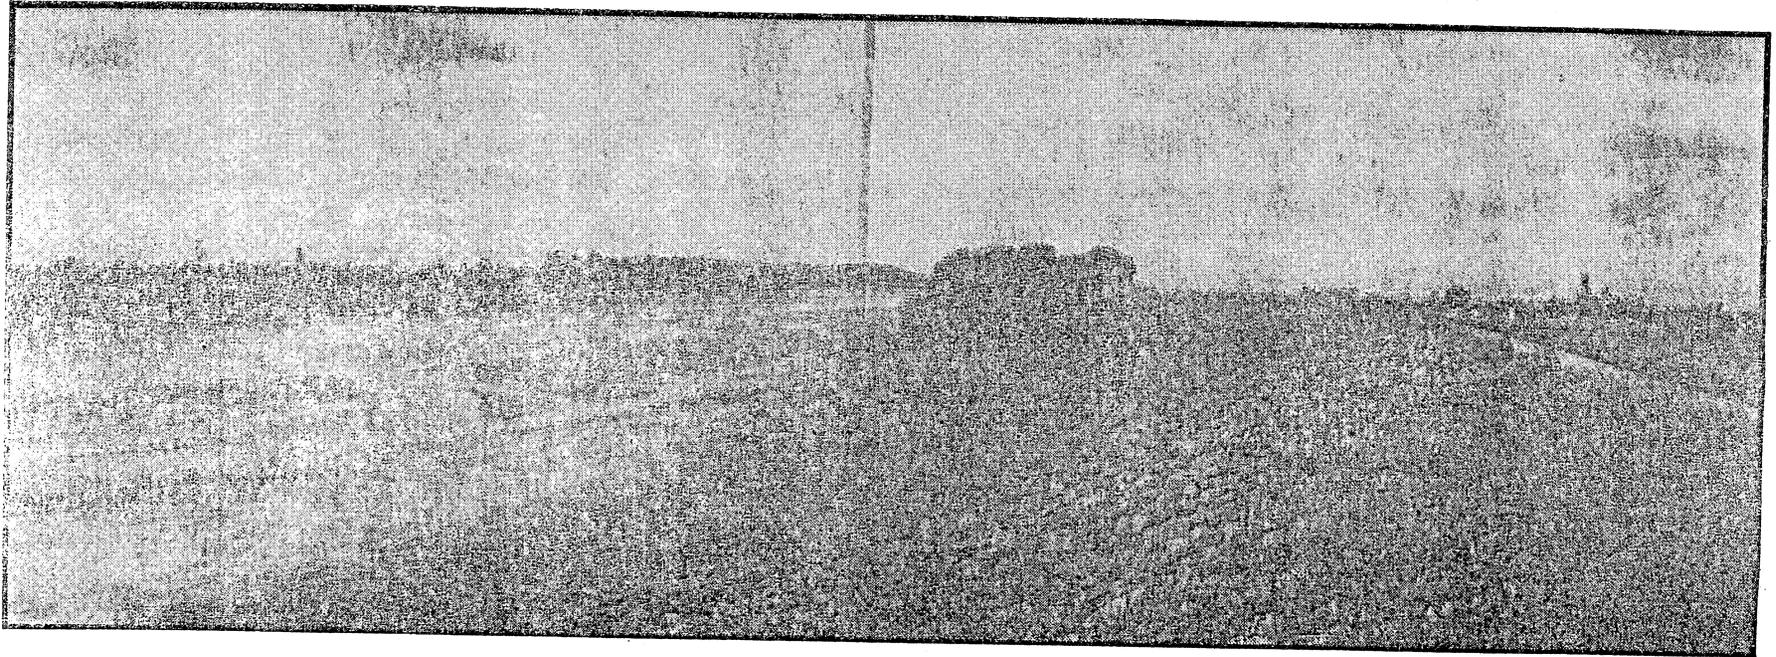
North levee looking upstream toward Westgate Bridge ( $\approx$ R.M. 86).
